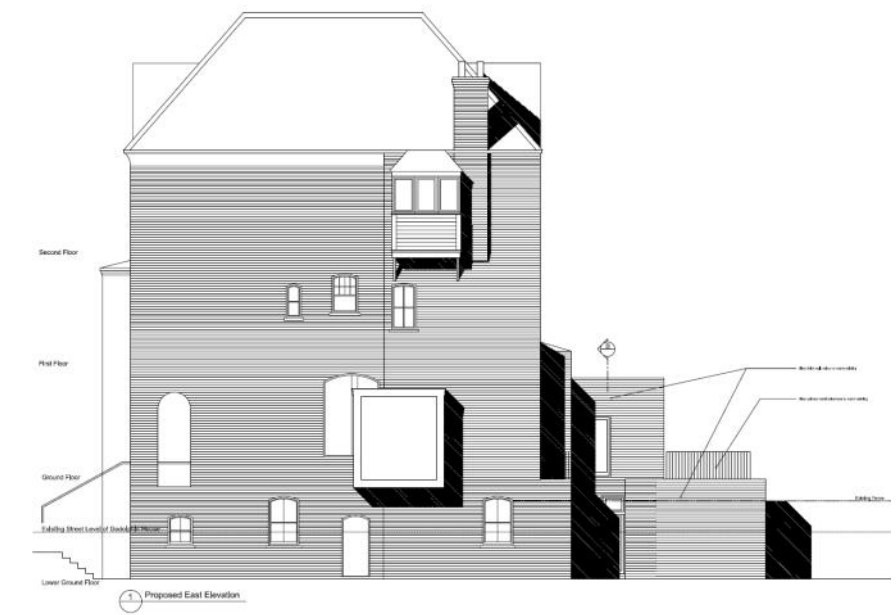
Consented east elevation (side elevation of No. 86) illustrating the projection and arrangement of the rear extension. This scheme was consented in 2007 and the consent was renewed in 2010.
